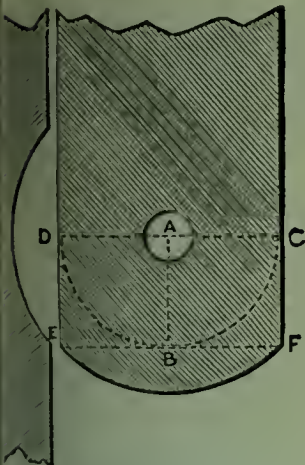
, 527, illustrate an example of a centre-pin hinge, the door opening either way, and folding back against the wall in either direction. Draw E F at right angles to A B
